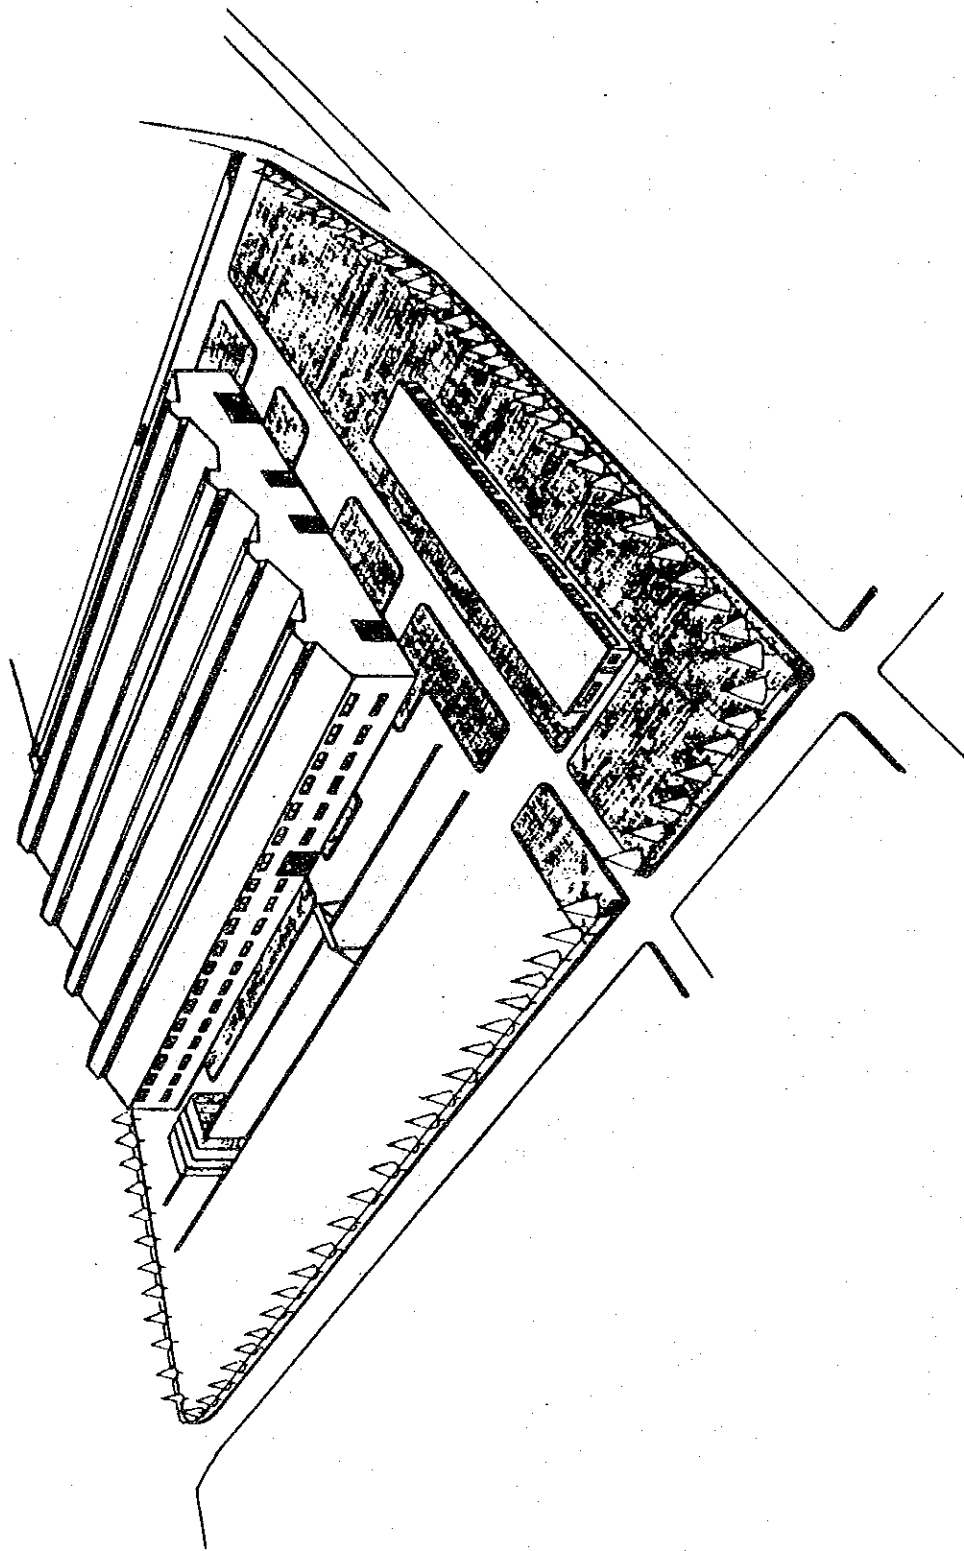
BIRD'S VIEW OF SHOP BUILDING
